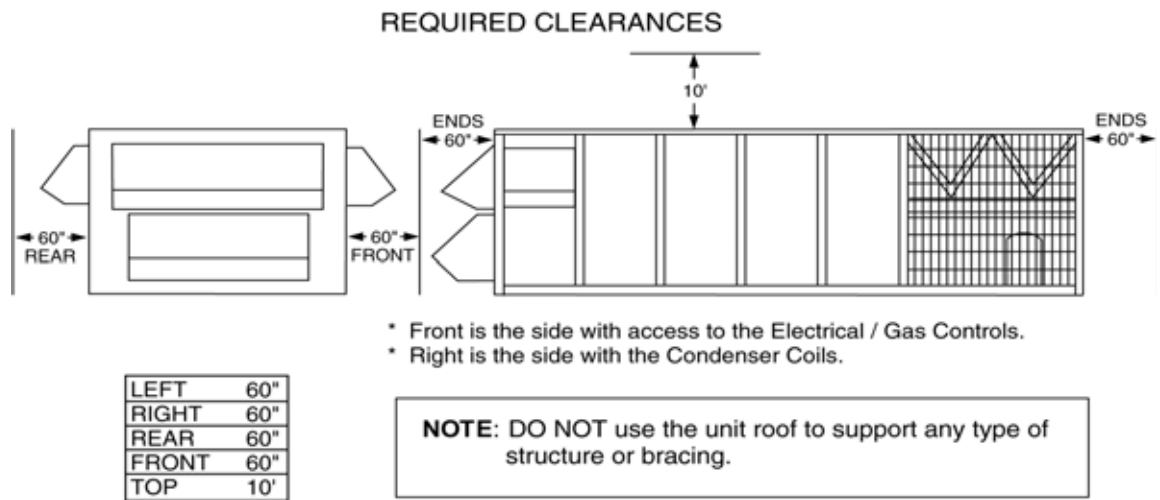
CLEARANCES - HOOD/ECONOMIZER & MOTOR DRIVE - SIDE
